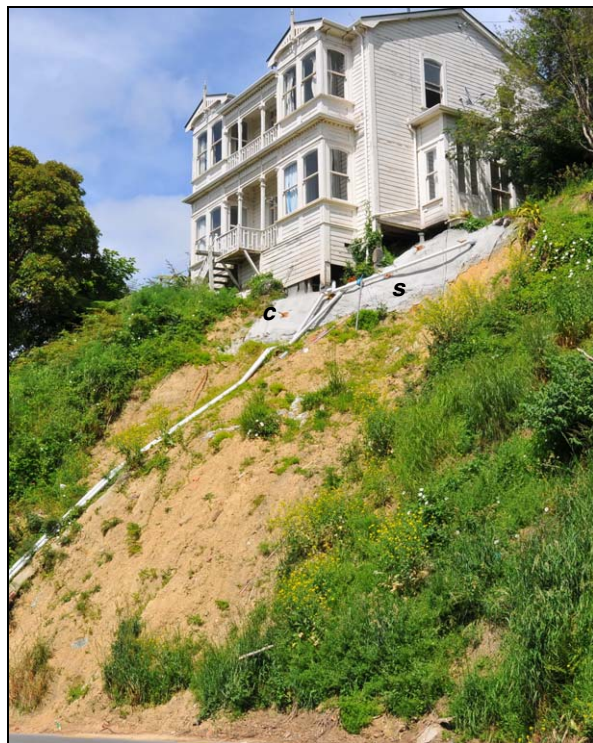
Photo of the batter failure below the house in Devon Street taken in December 2008. It shows that the slope was eventually stabilised using long grouted cables (c), shotcrete (s), and drainage, allowing the house to be reoccupied.
